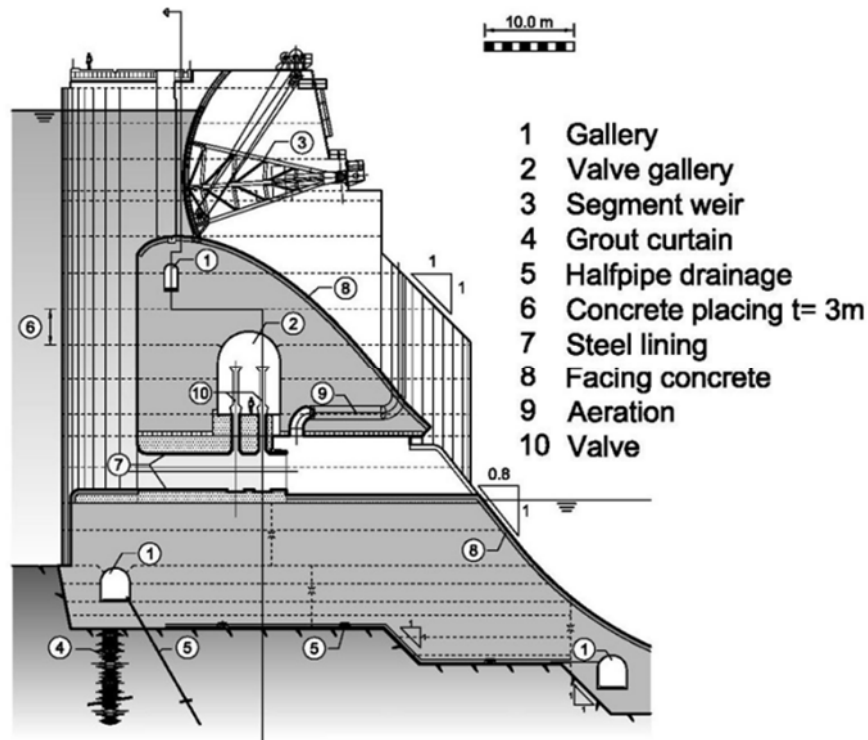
Example of a common design of a gravity dam: cross section through the spillway (Institut für Wasserbau und Wasserwirtschaft, 2012)
